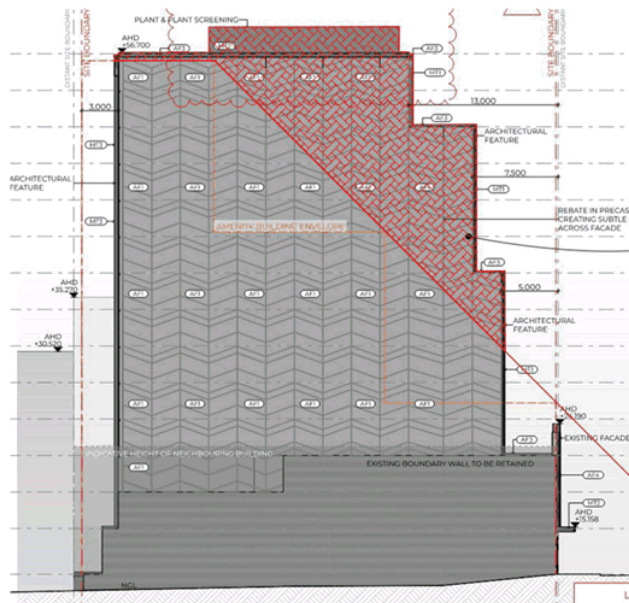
The south-western elevation of the proposed development, with that part beyond the amenity building envelope hatched in red.
